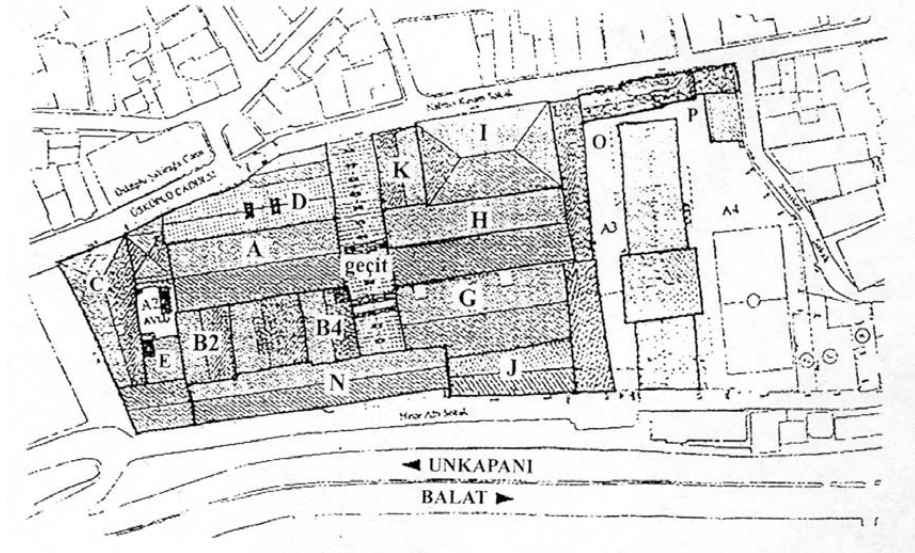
Building Survey Layout Plan of Cibali Tobacco Factory (Erdoğan, 2002)
